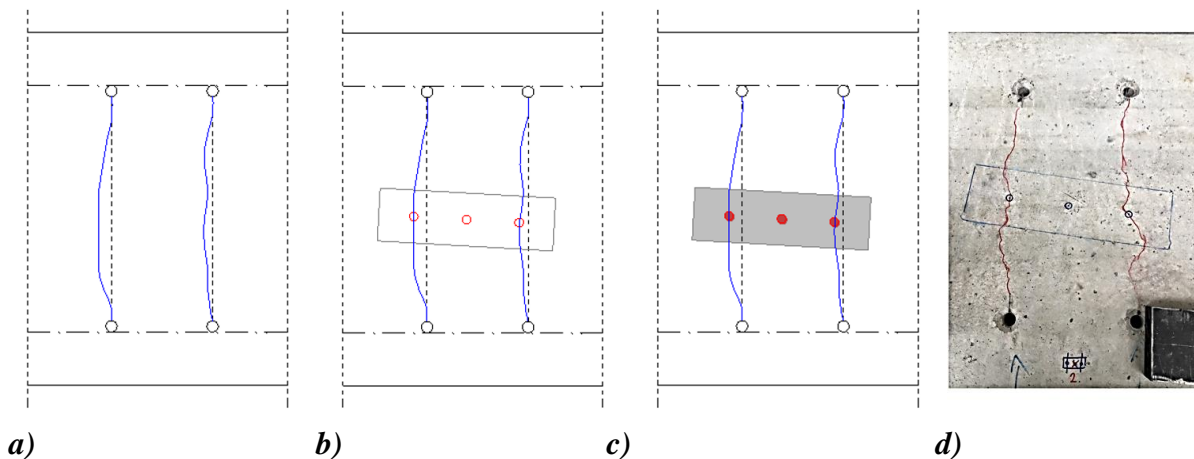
Installation steps of anchor groups in cracked concrete: a) formation of hairline cracks; b) drilling the holes using steel template and checking the presence of the cracks in the holes; c) installation of the anchors, d) photo of the first installation step
